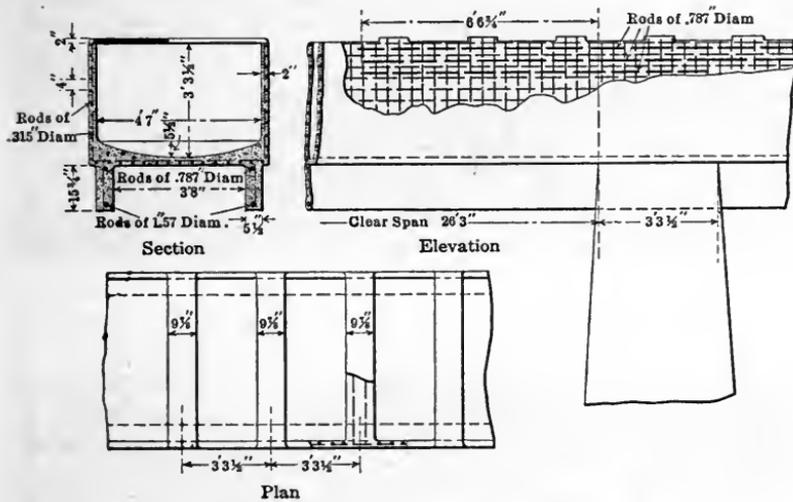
Reinforced concrete flume of Hamiz, Algeria.
